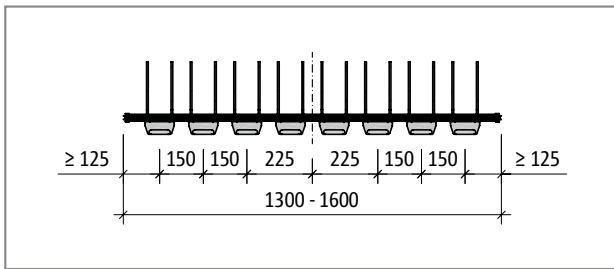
Schöck Tronsole® type T-V8-H...-L1300 to L1600: Product layout
